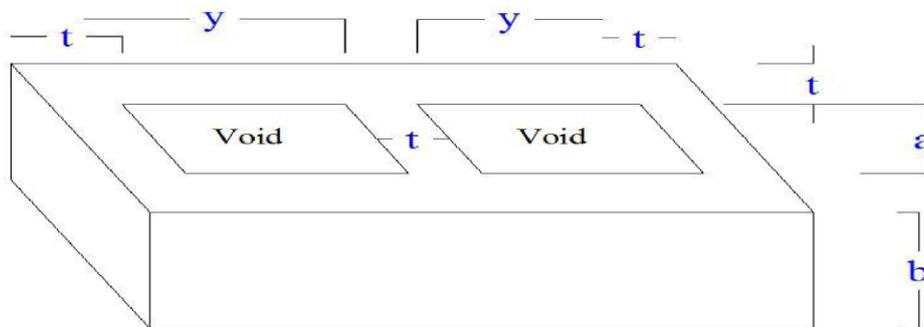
The Sandcrete Hollow Block Mould Dimension
